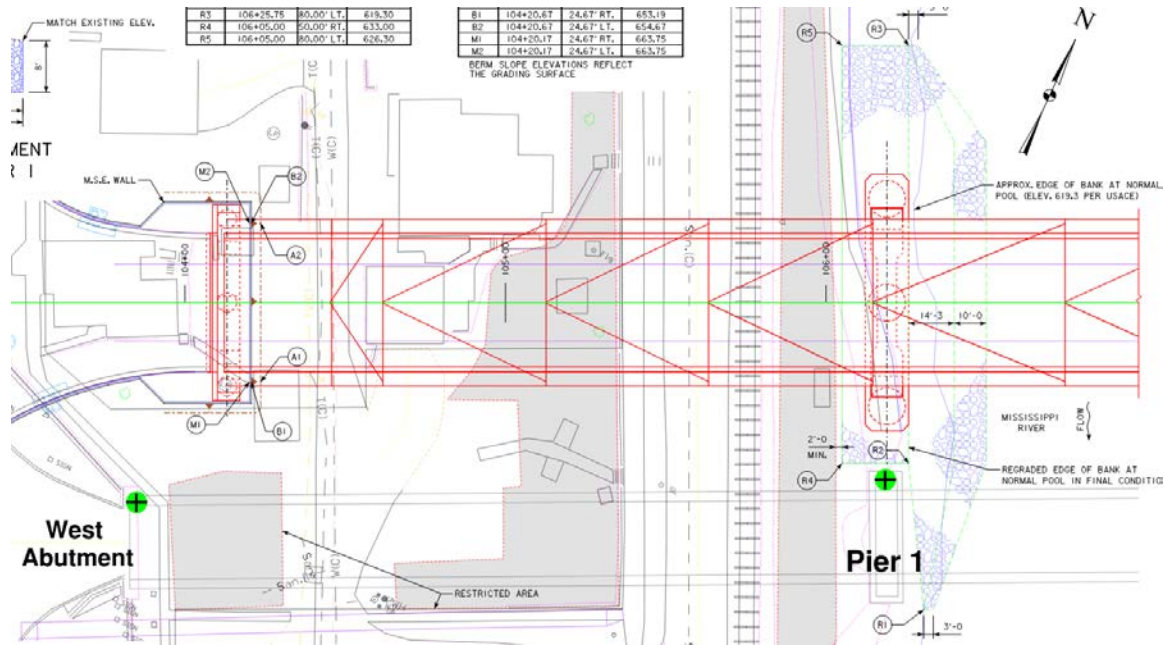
Preliminary Monitor Locations –West Abutment and Pier 1.
